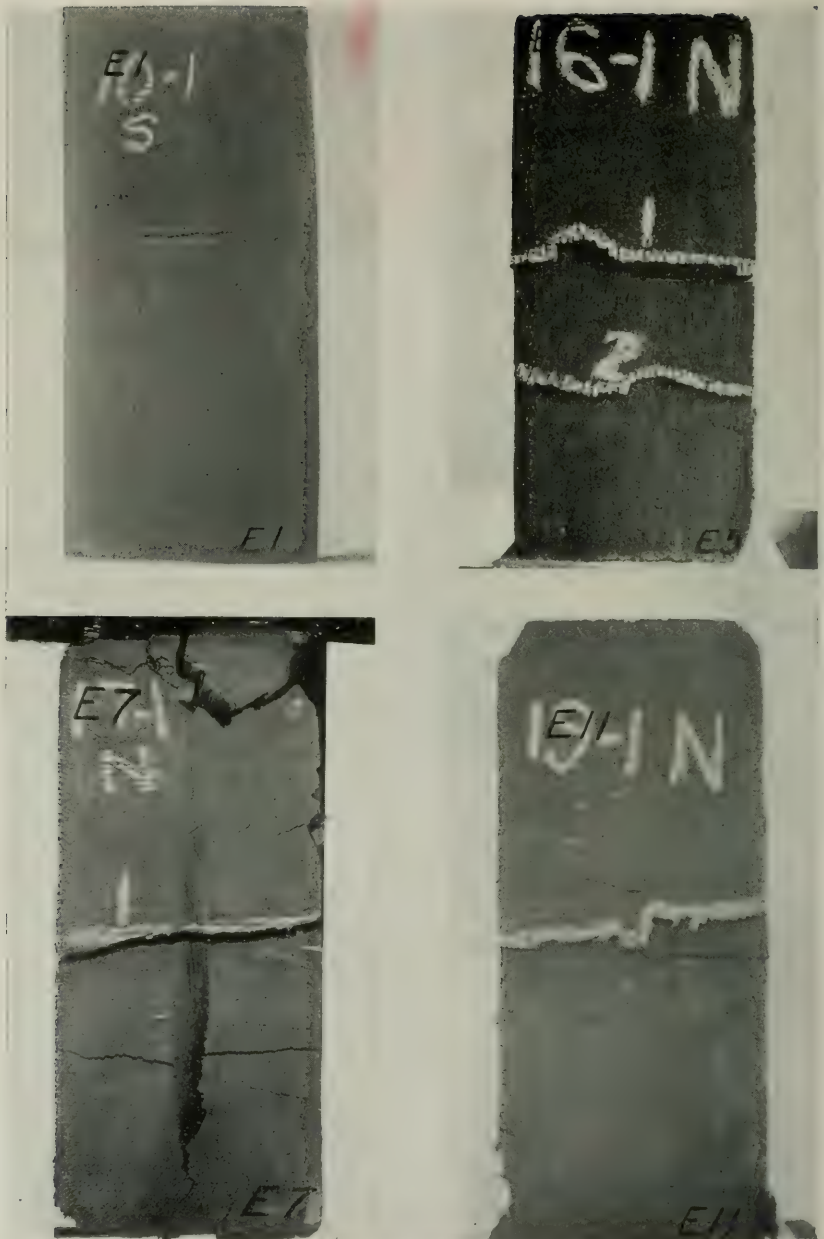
VIEWS OF ENDS OF BEAMS AFTER FAILURE.
